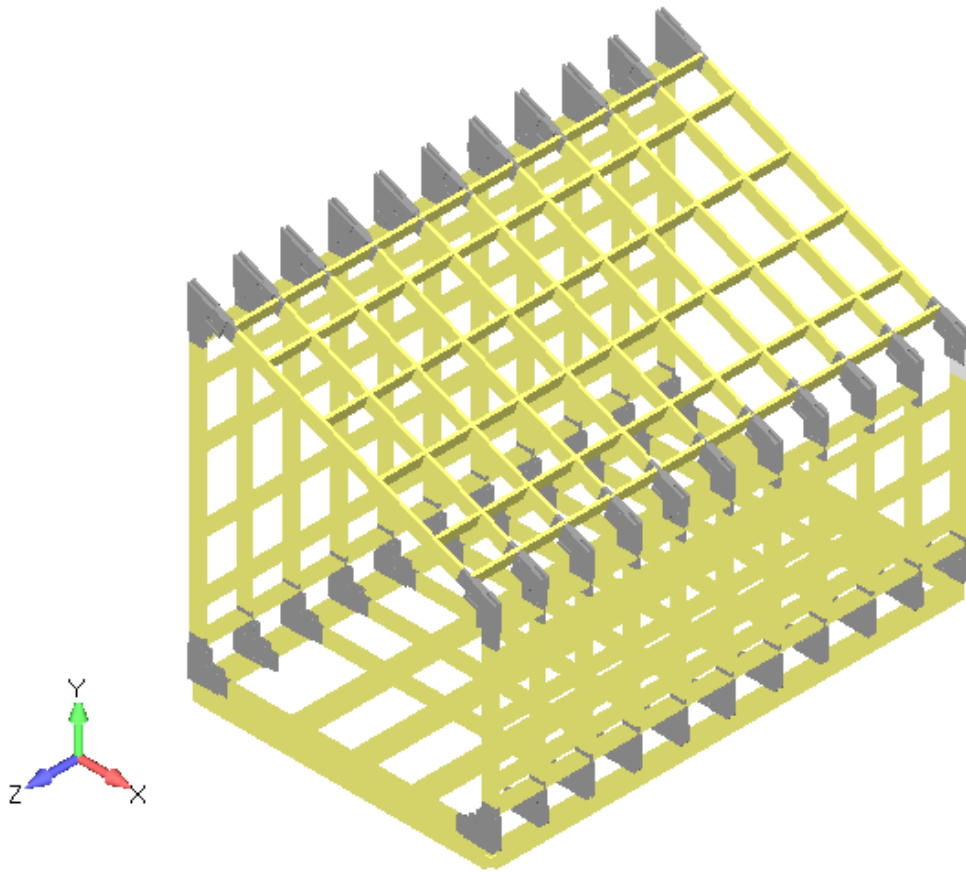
General view of the frame of the FINHA shed-roof building, frame width 4 m
